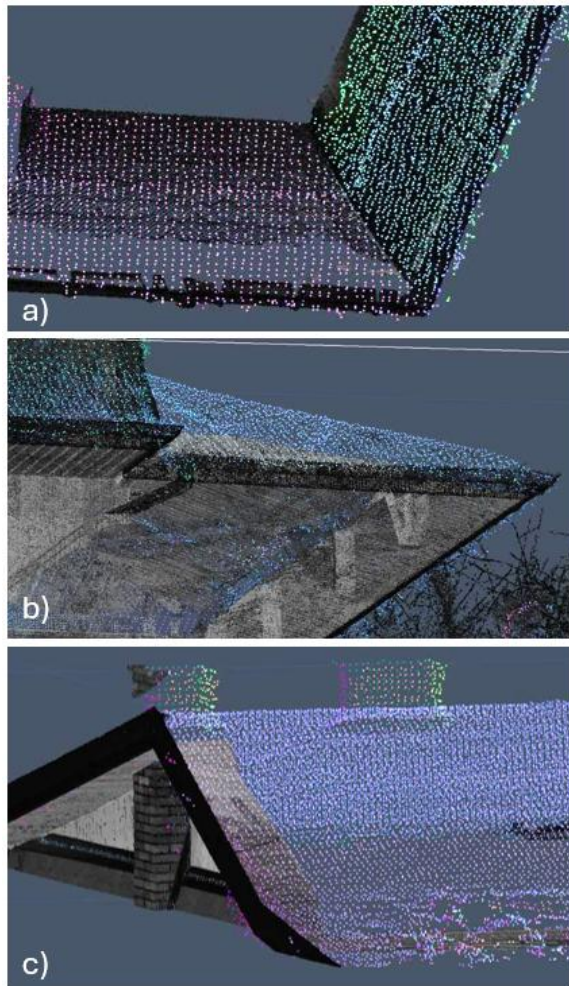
Point clouds from TLS – gray scale and UAG image-based - RGB a) roof corner b) roof eave, c) roof ridge.
